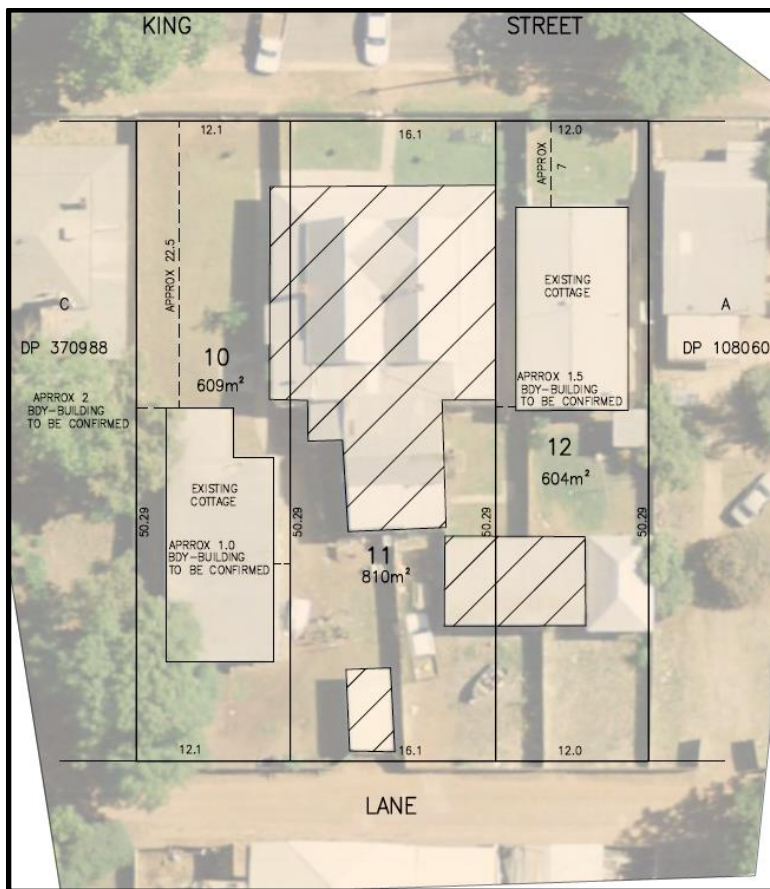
Proposed Lot Layout and Structures to be removed under CDC Application (Source: Wagga Surveyors)
